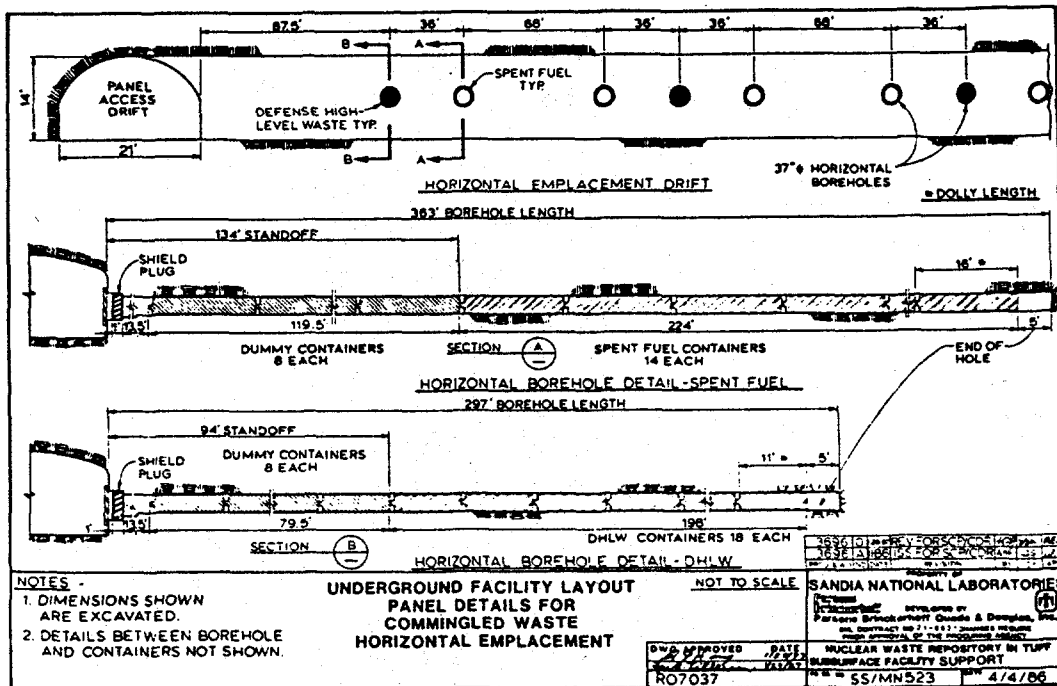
Plan and Cross-Sectional Views of the Horizontal Commingled SF and DHLW Emplacement Configuration [MacDougall et al., 1987, Chapter 4]
